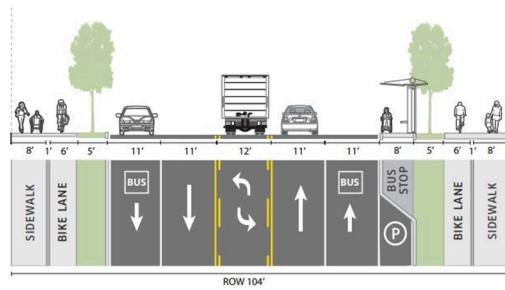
B Street Elements and Widths for 72nd Avenue Red
